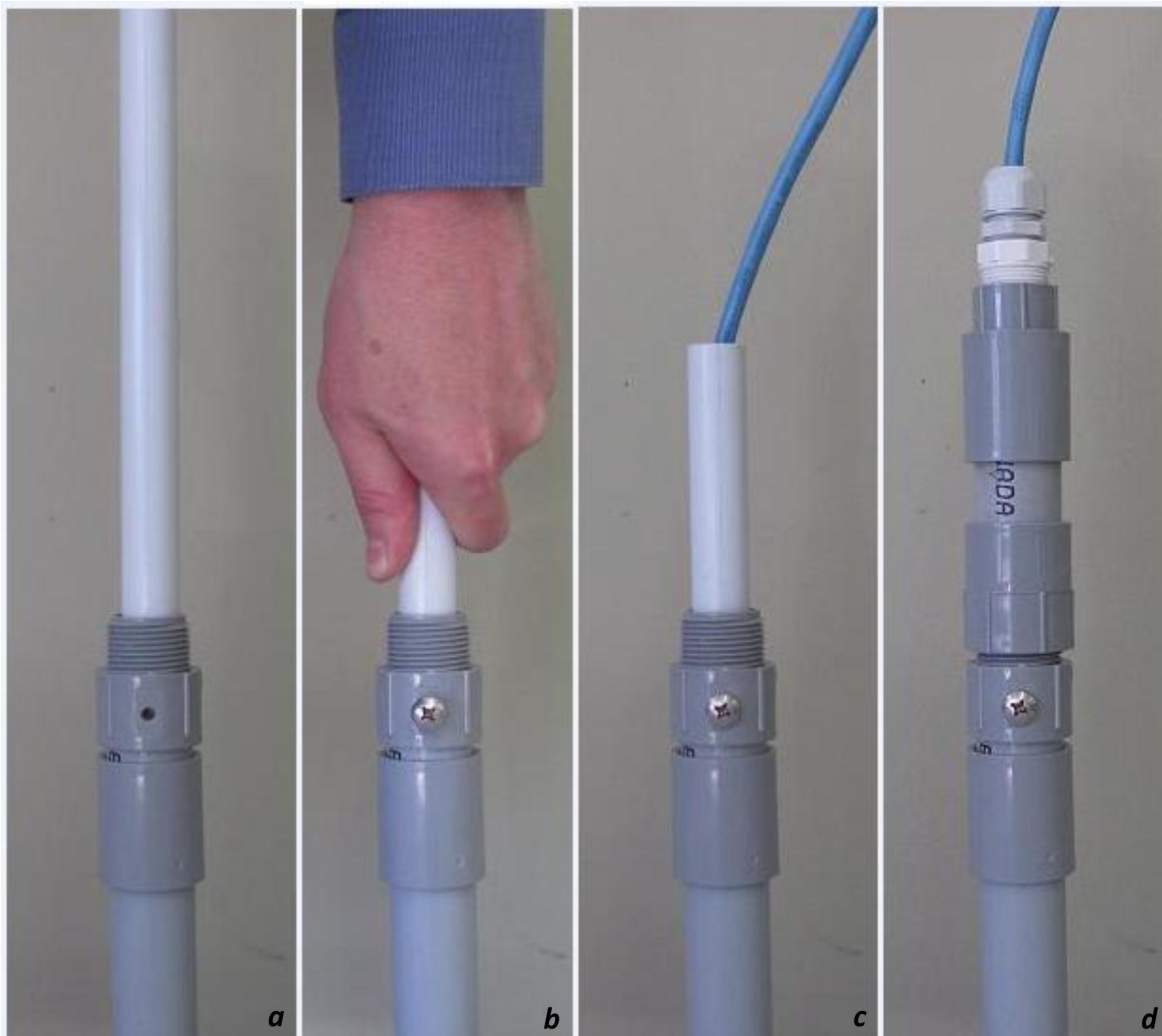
Using the pre-assembled fittings stack during SAA installation. (a) Glue bottom portion of the pre-assembled fittings stack to the PVC conduit. (b) Apply compression to the top of the SAA and tighten set screw, see SAA Installation Guide for more information on compressing the SAA. (c) Remove excess PEX using the PEX cutter. (d) Thread the top portion of the pre-assembled stack over the cable and screw into the bottom portion. Tighten the gland at the top until the rubber seals the cable.
